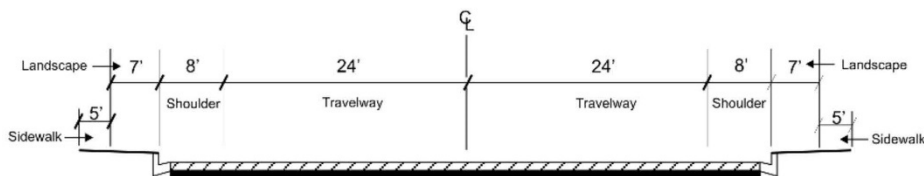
CITY OF CORONA GENERAL PLAN ROADWAY CROSS-SECTIONS (PAGE 1 OF 2)
